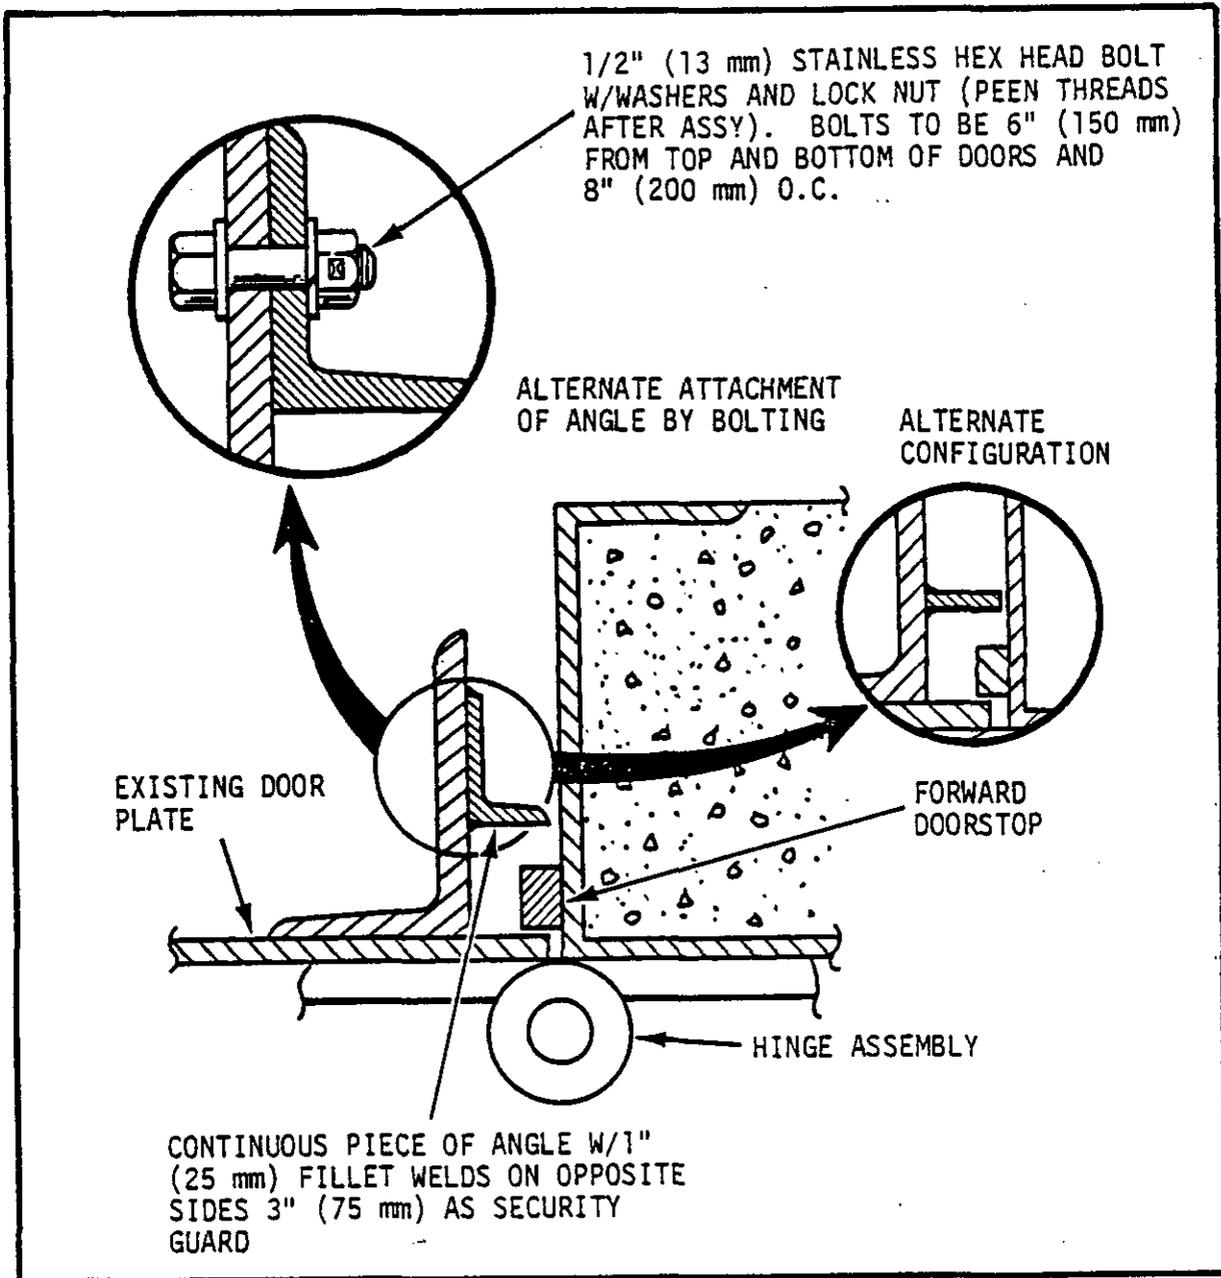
Typical hardening plan for doors using a forward doorstop with angle.
